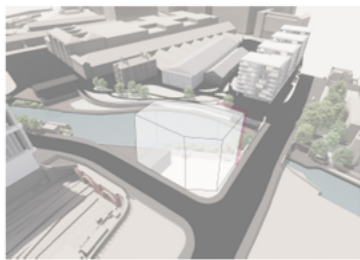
Reduced massing and relating to the scale of Building J with a positive elevation for western approaches from York Way
